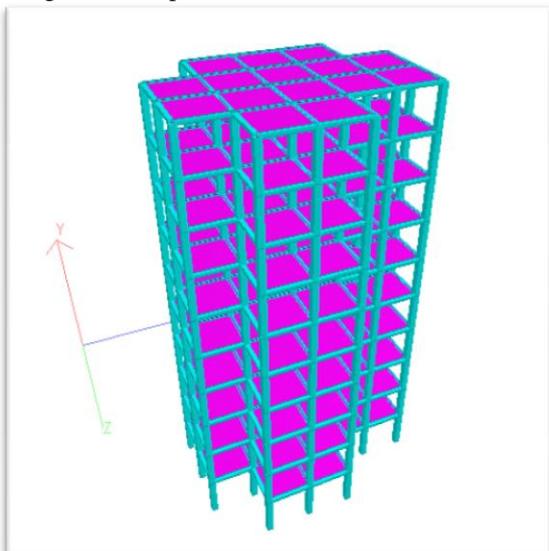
STRUCTURE WITHOUT SHEAR WALL
